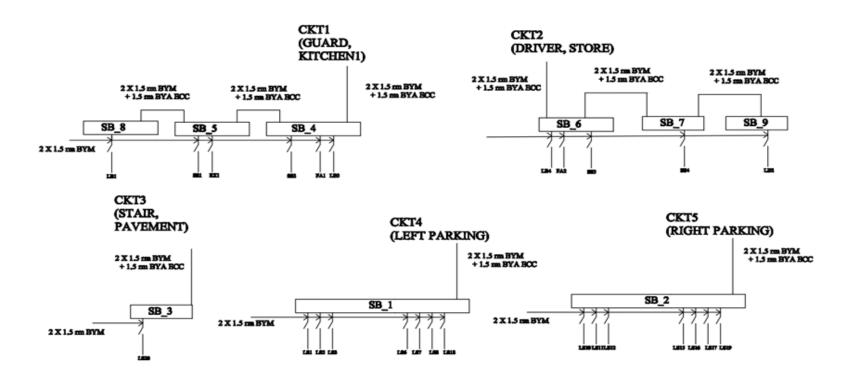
Switch Board Connection Diagram (Ground Floor)
